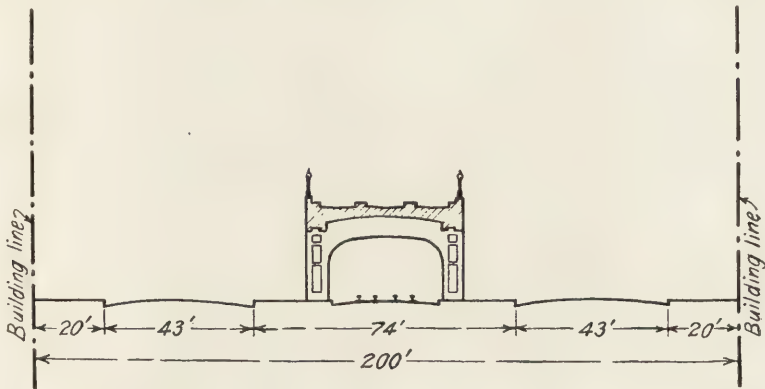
Cross section of Queens Boulevard, New York City, showing three-track elevated railroad on reinforced concrete structure, with service tracks beneath.
